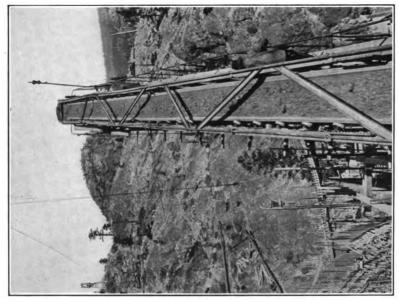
Fig. D.—Belt conveyor for concrete, at Lake Spaulding dam.
